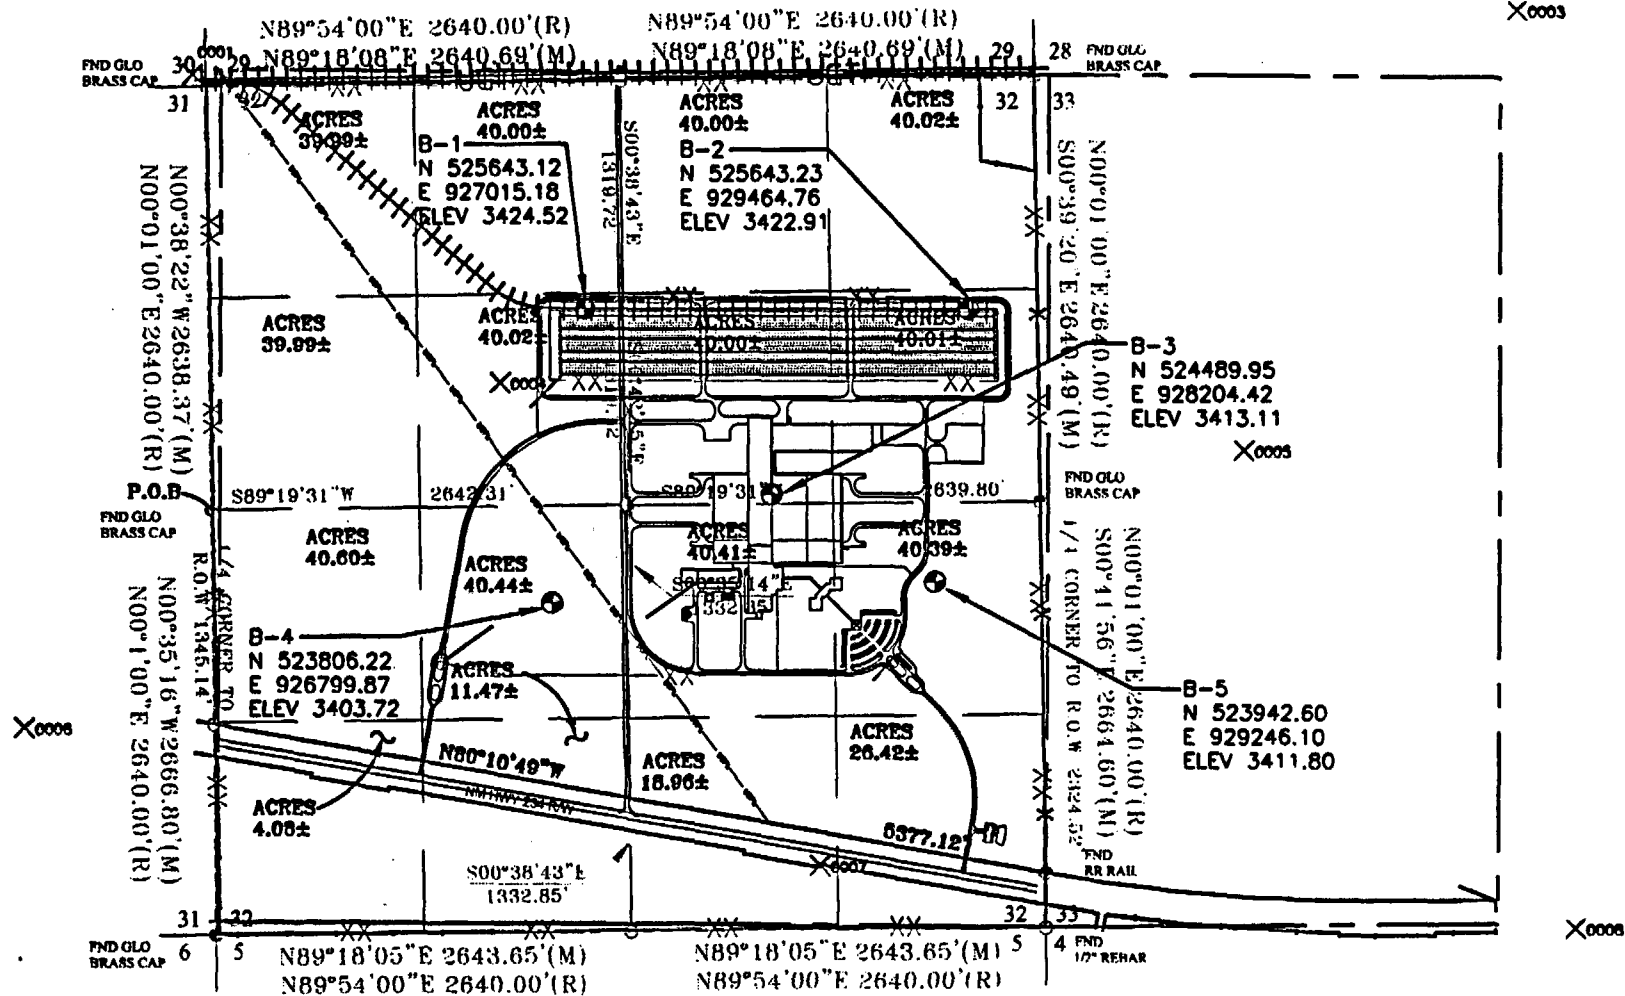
SITE LOCATION PLAN NATIONAL ENRICHMENT FACILITY LEA COUNTY, NEW MEXICO
